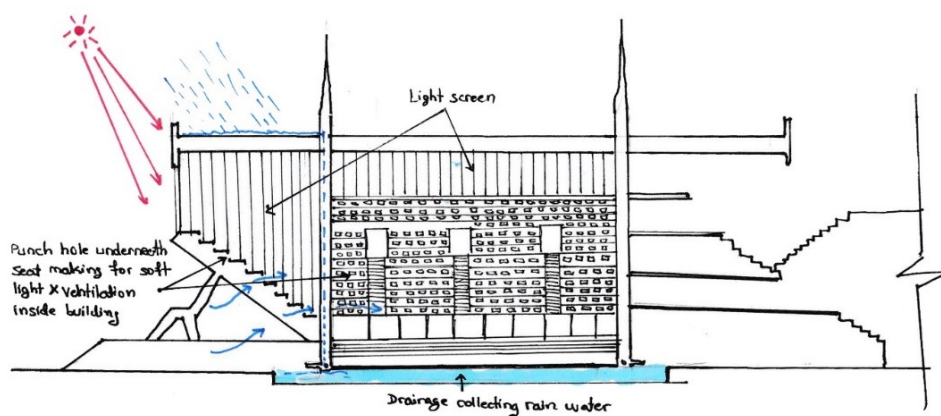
Diagram drawing of a slanted wall functioned as a wall and audience seats.
